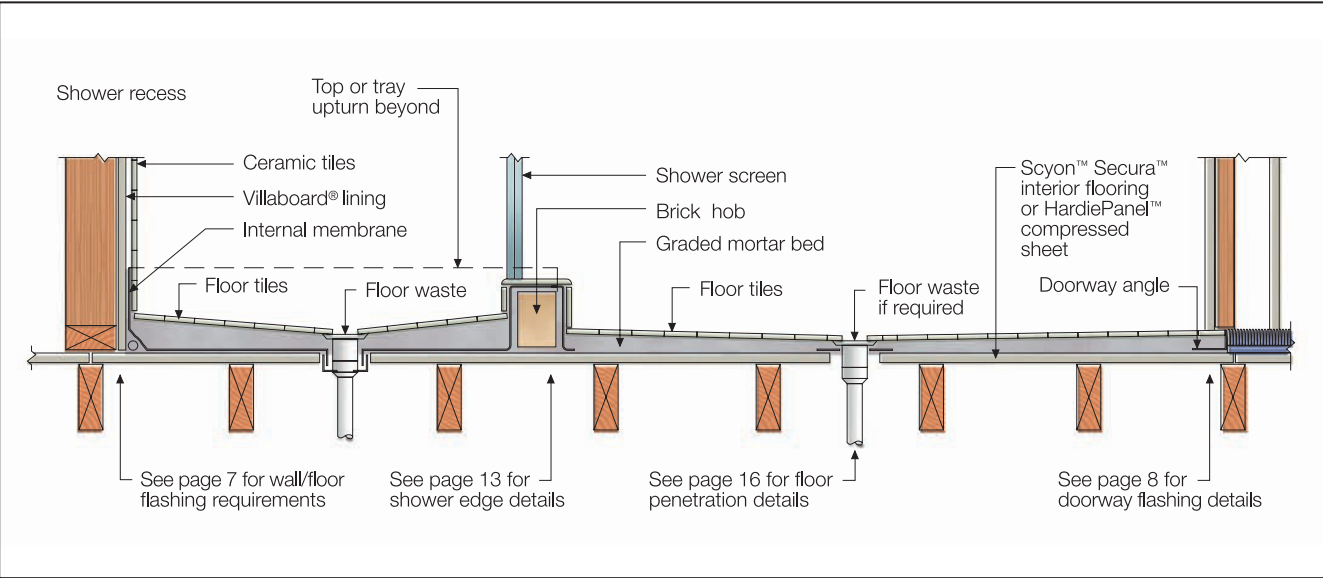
TYPICAL BATHROOM CROSS-SECTION
